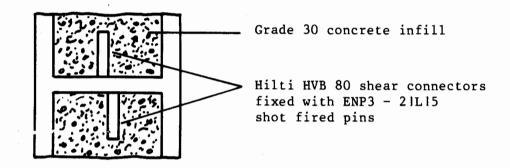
DETAILS OF HILTI SHEAR CONNECTOR LOCATIONS AND (R4/2195) FIG. 6 CONCRETE INFILL - TEST NO. TE 7382
